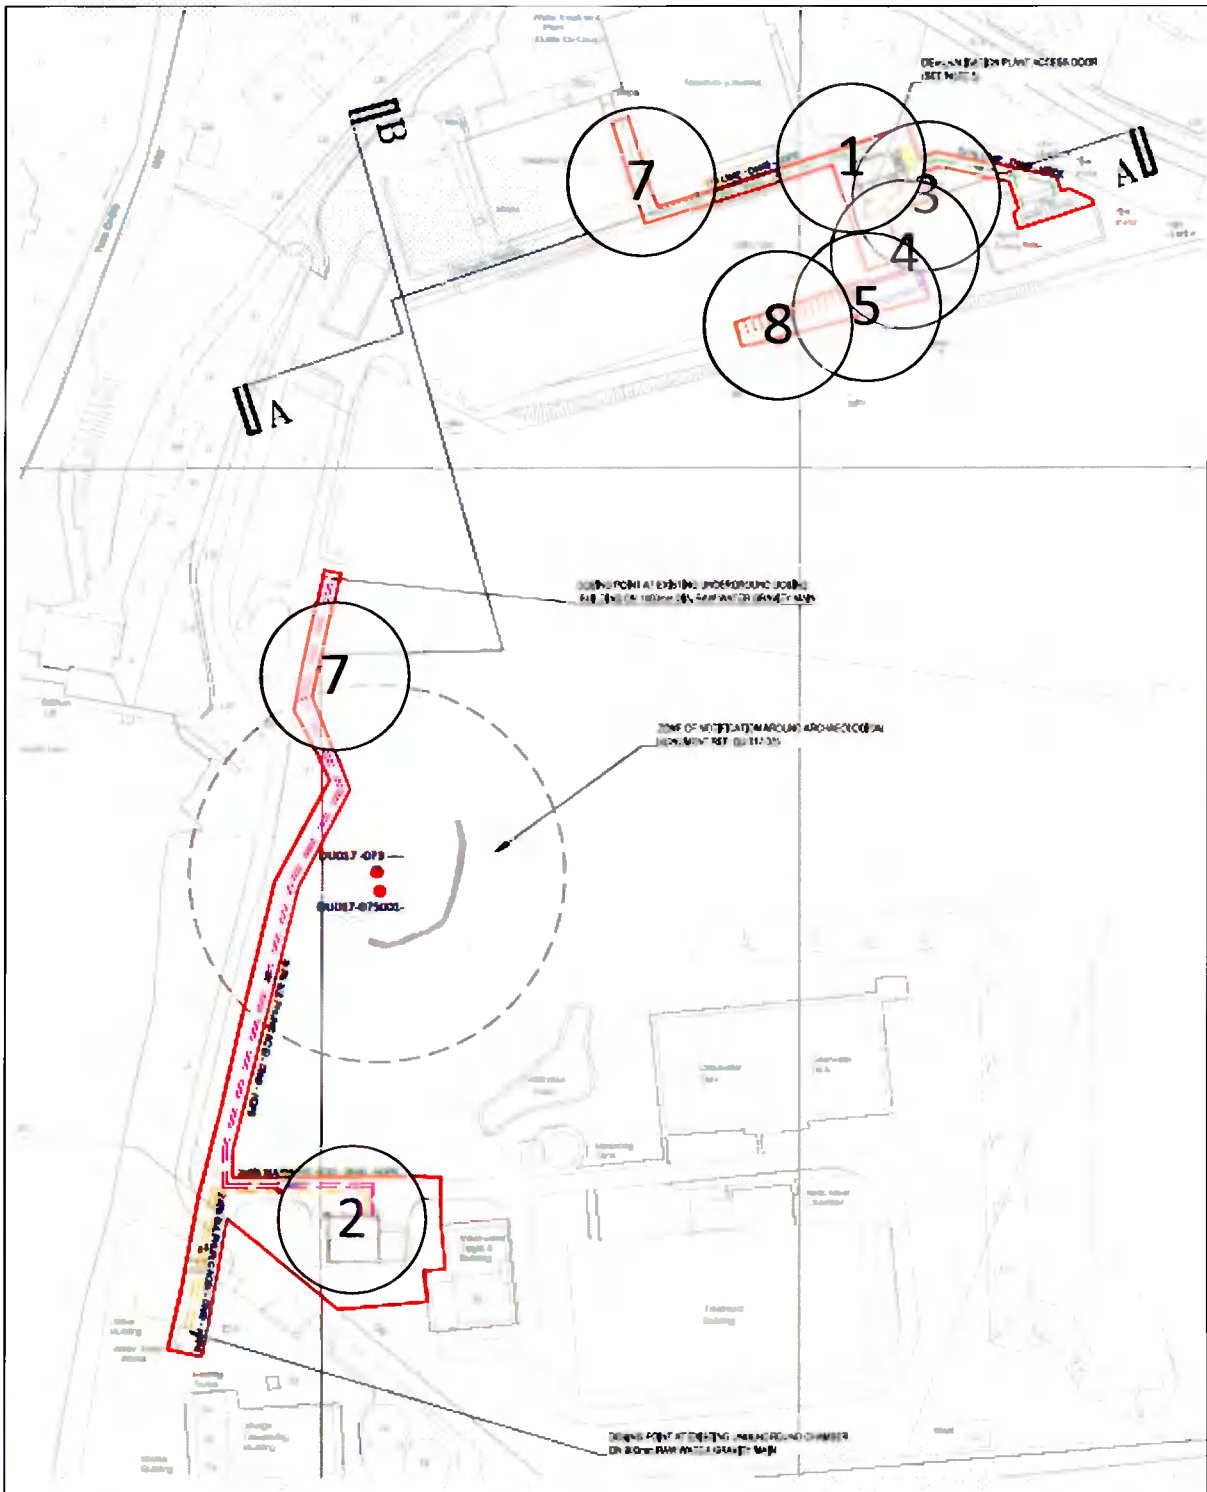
Site Layout Illustrating Elements of the Proposed Development (Extracted from Planning Drawing No. 11118-RHL-LP2-XX-DR-PL-0003)
